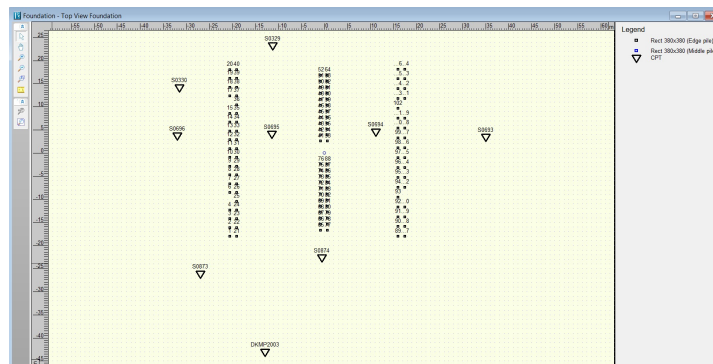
Top view foundation in D-Foundations with new CPT set only
